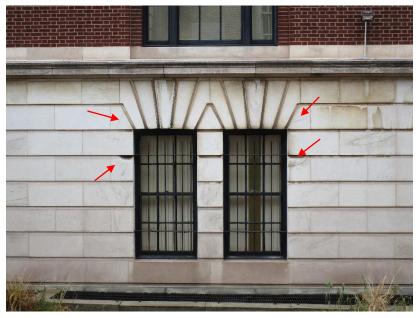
Spalls and cracks at marble where steel security grilles are set into the stone.
